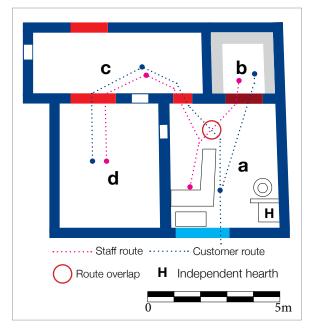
Type 3 floor plan at IV.17 Herculaneum, with potential traffic routes.
